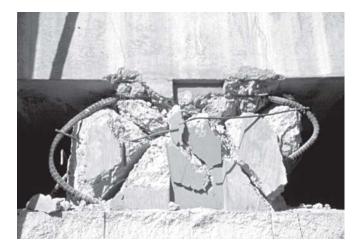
Short columns in this parking structure failed in the 1994 Northridge earthquake. Modern building codes now require much more reinforcing steel for such short columns.
